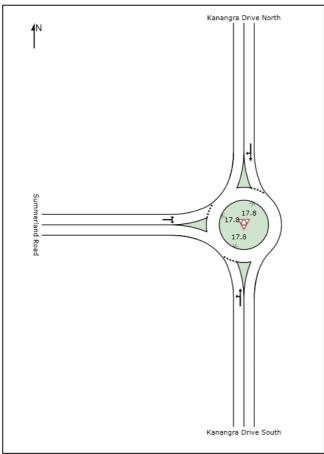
Roundabout intersection of Kanangra Drive with Summerland Road (SIDRA)
